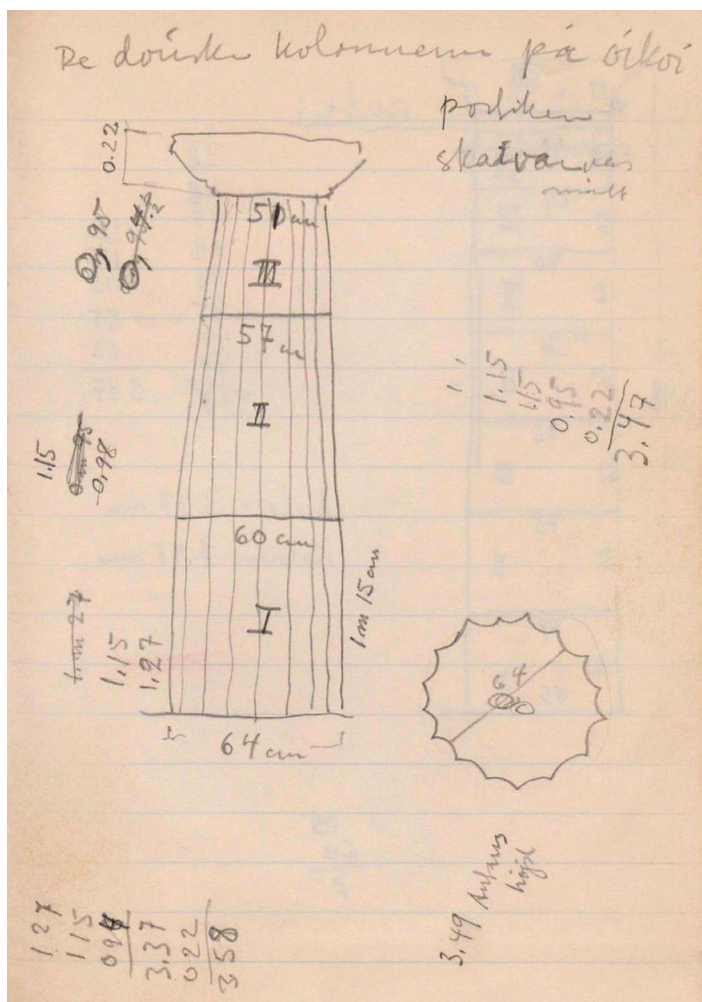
Notebook sketch of the reconstructed column height (A. Westholm, 1960; LabArN:074, p. 3).
